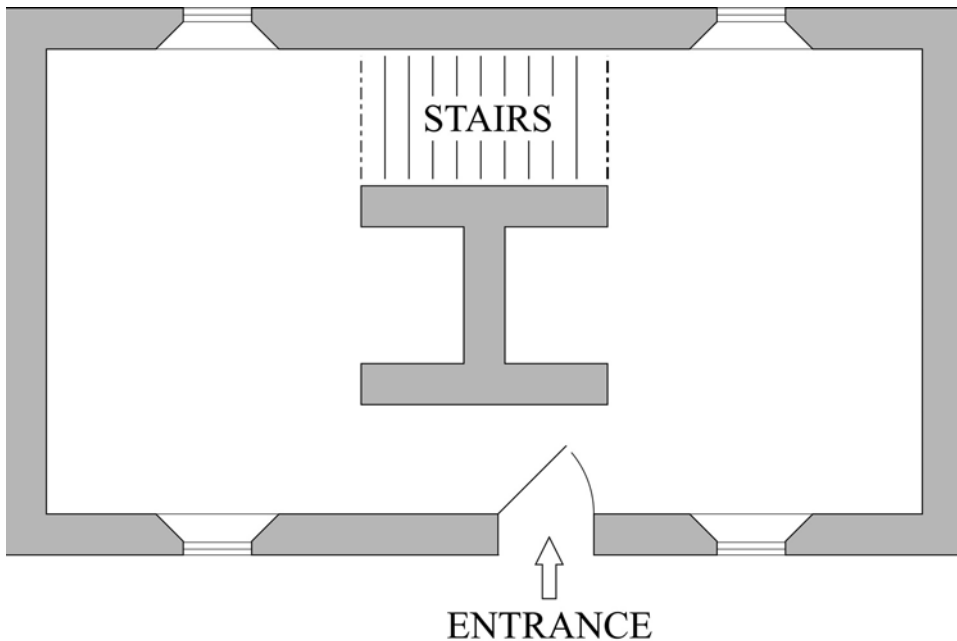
Simple plan of the lobby-entry house, with the chimney in the centre providing fireplaces to rooms on each side. Author's own diagram.
